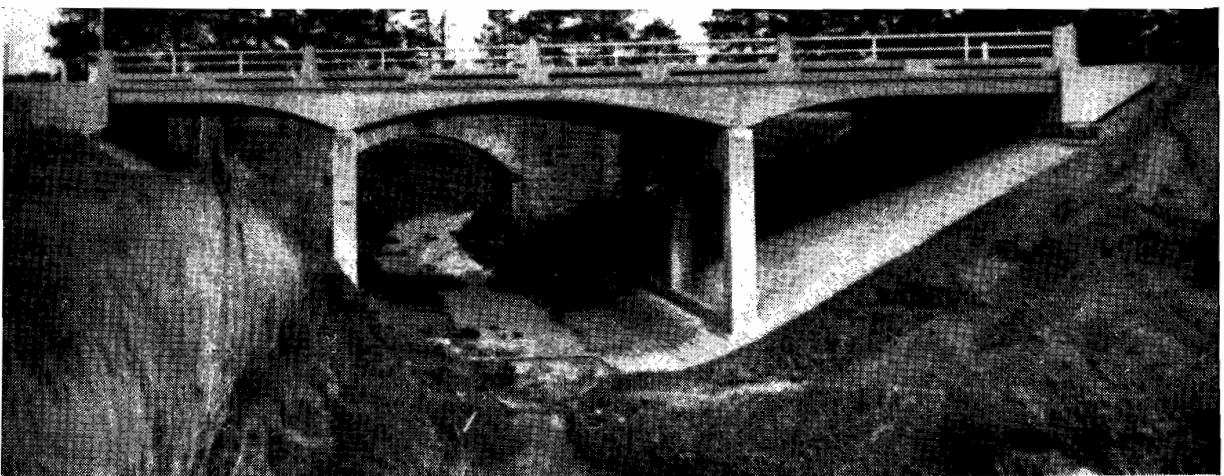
New concrete bridge over Waurn Ponds on Princes Highway West.
